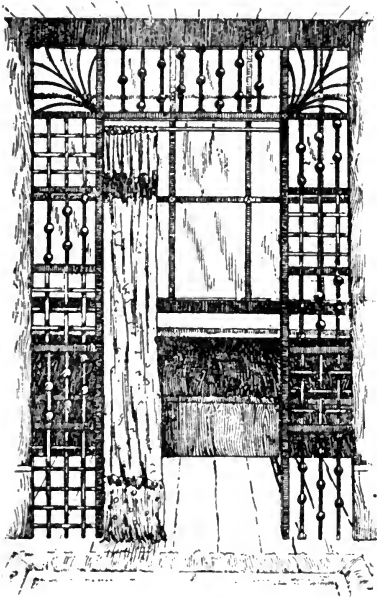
DOORWAY BETWEEN DINING AND PLANT ROOM.
